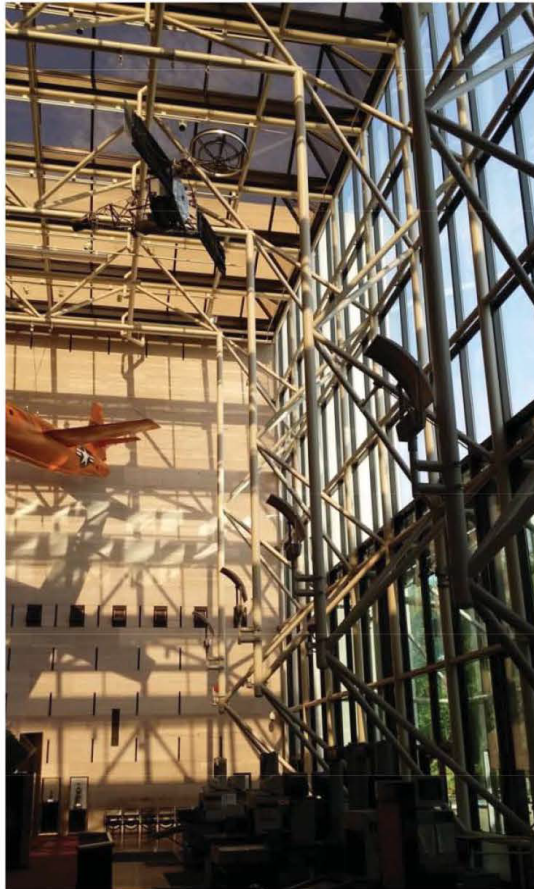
3: Warped Stone Panels on West façade. (Source: QEA.)
